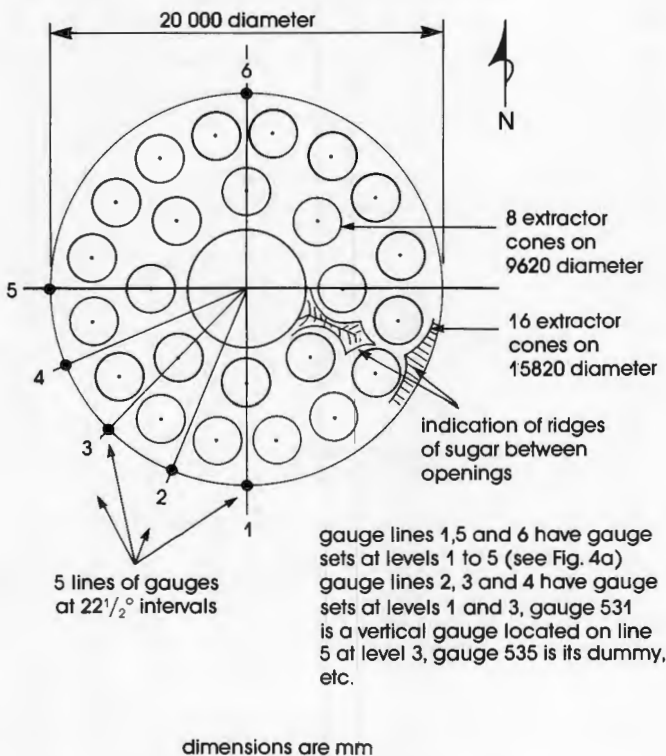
Layout of extractor cones in base of silo and layout of instrumentation in plan
